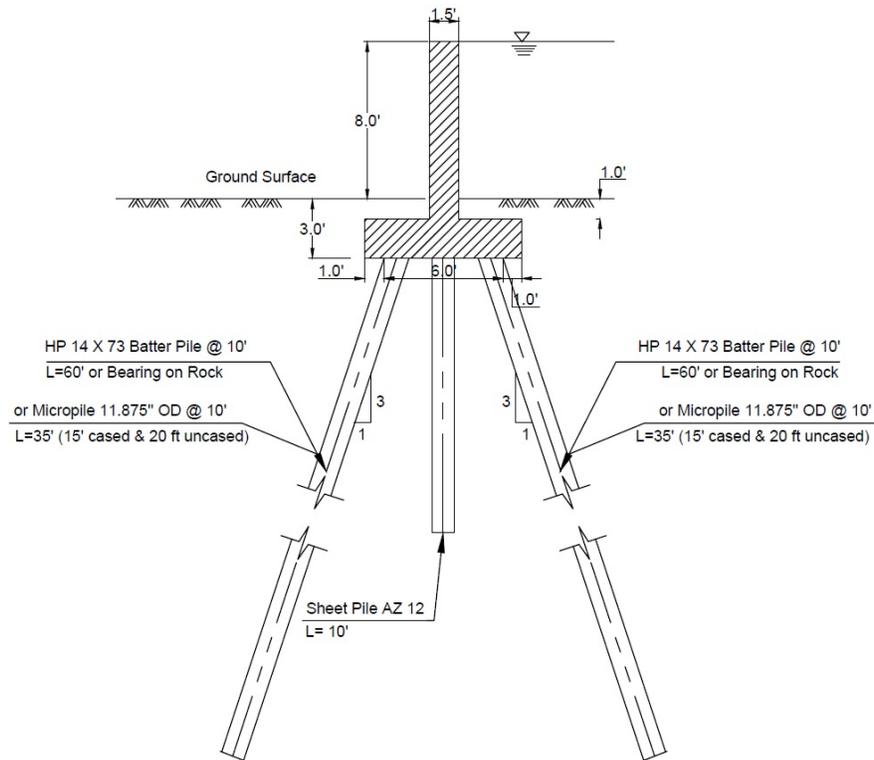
Cross-section of 8 feet T-wall for Soil Areas 4 to 7
